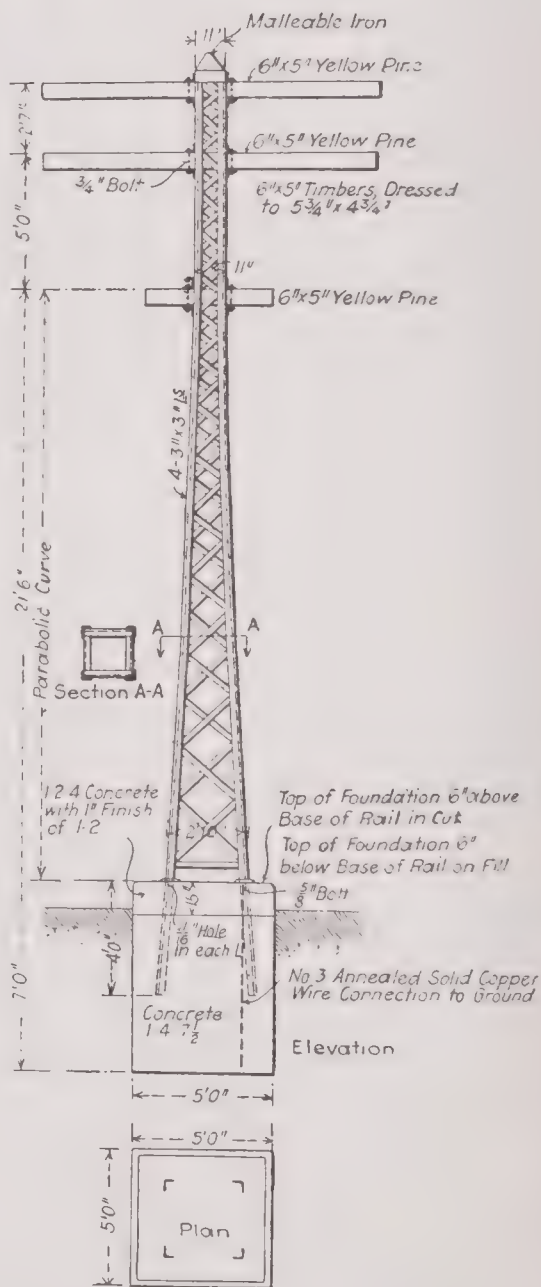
A. NEW YORK CENTRAL RAILWAY : PLAN, ELEVATION, AND SECTIONS OF POLE FOR TRANSMISSION LINES.
